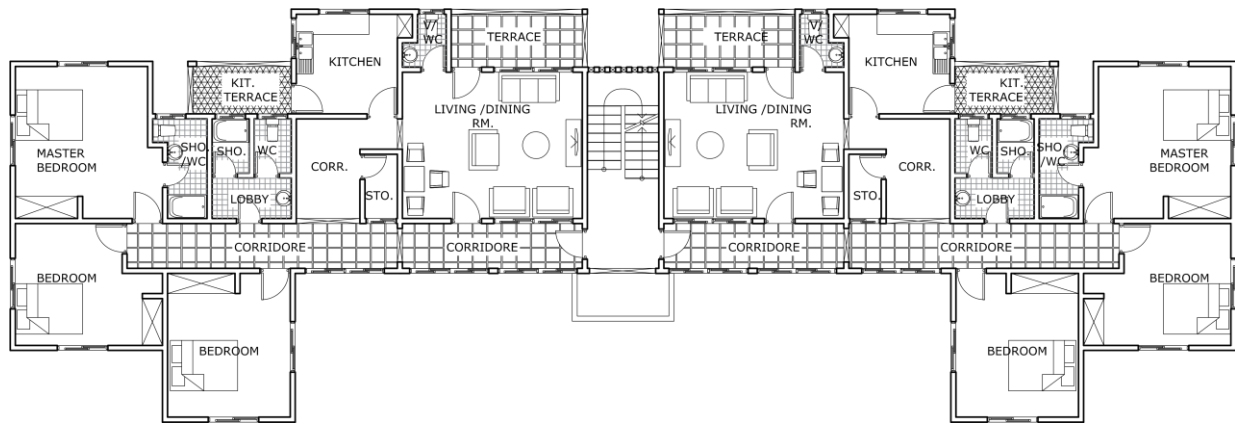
A typical floor plan of a 3-bedroom SSNIT Flat in Adenta
